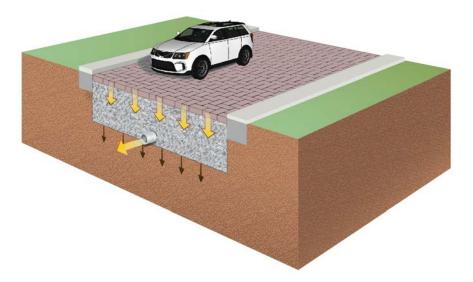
Typical distributed permeable pavement schematic showing underdrain option (arrows indicate water pathways).
